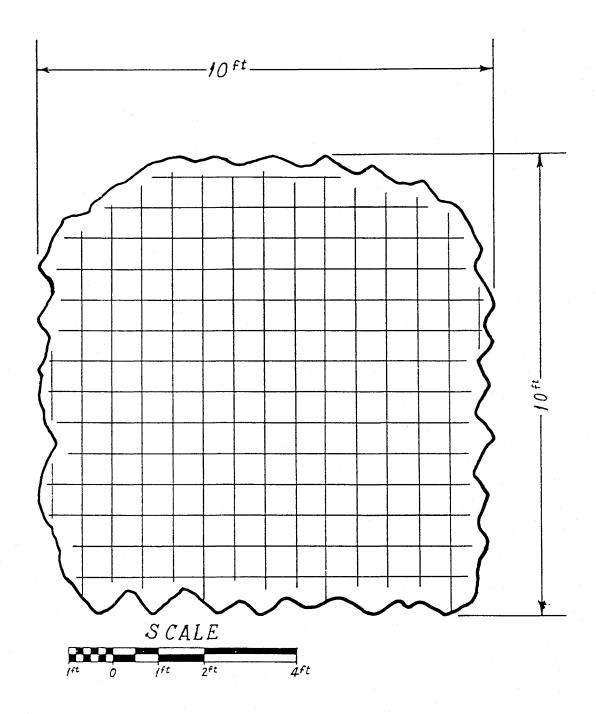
Water-side rebar cage (mat) for shrinkage and temperature shrinkage control in the F-Level Terry Tunnel, #6 bars, 12-in. spacing, 3-in. minimum depth of cover.
